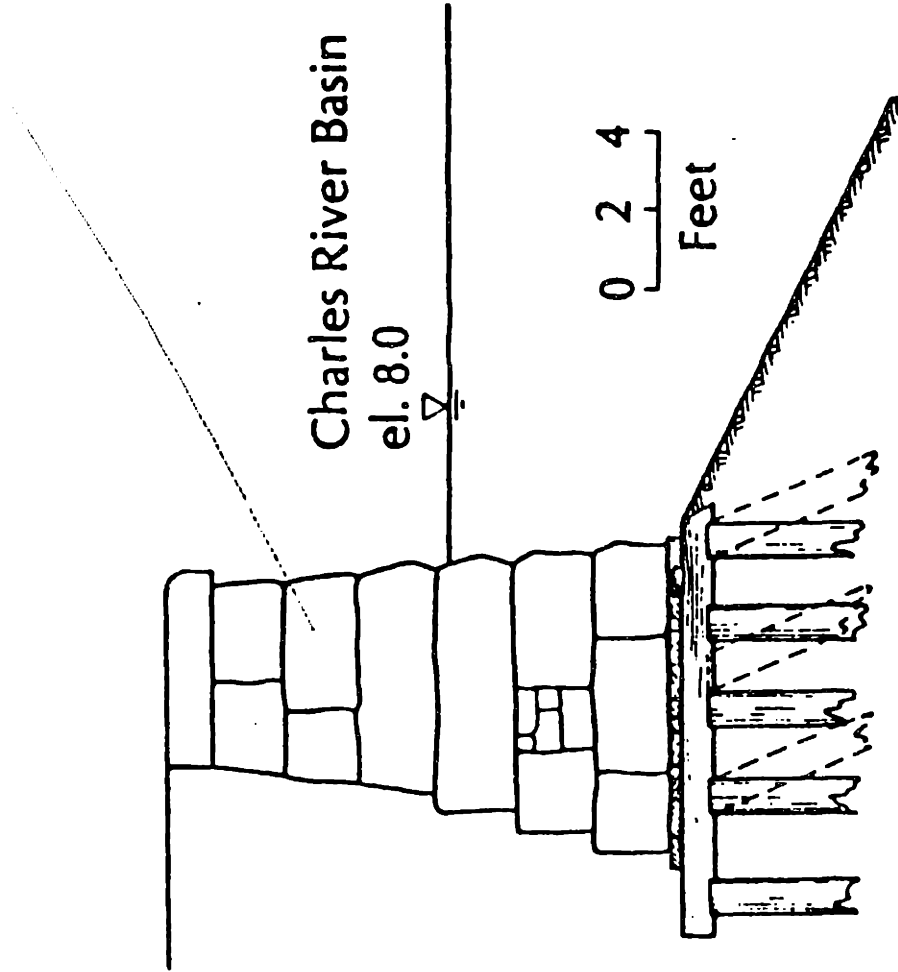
Cross-section of the Mill Dam (Aldrich, 1986)
